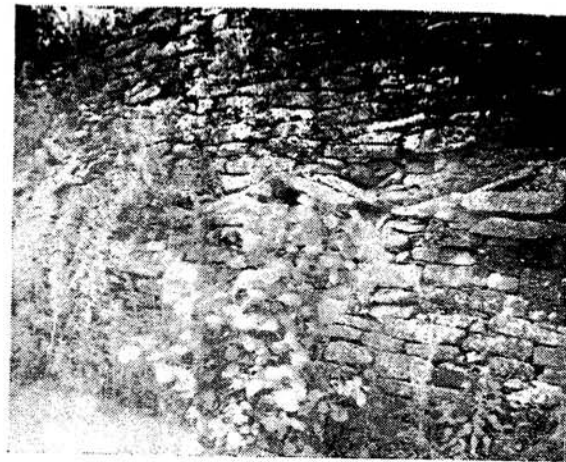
Collapsed retaining wall due to splitting away of stones near face. All stretchers are placed along length. Masonry behind face stones shows random dumping.
